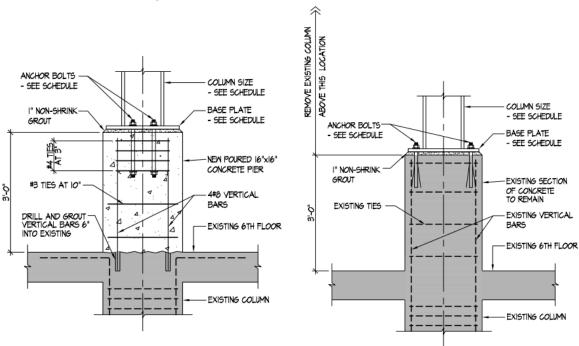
Column Base Typical Detail – New Pier (Left) and Existing Pier (Right), 3 & 4 on S/4.01
